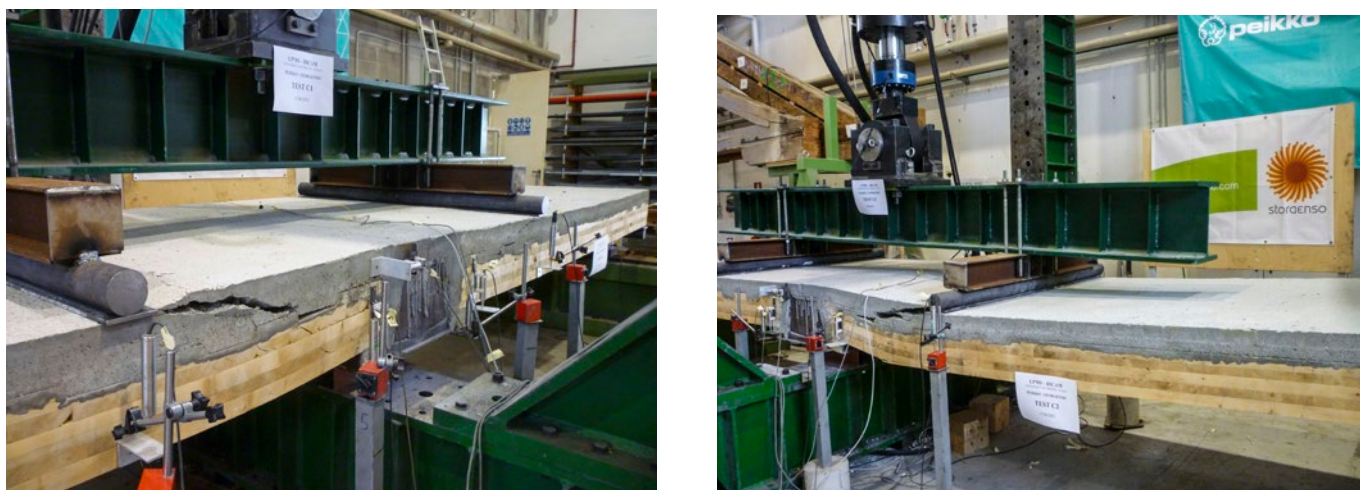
FAILURE OF COMPOSITE TIMBER SLAB SPECIMENS WITH BEAM DOWNSTAND
